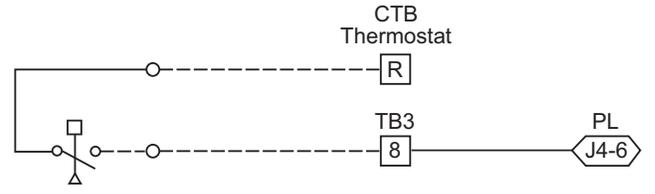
PremierLink Wiring Fan Pressure Switch Connection
